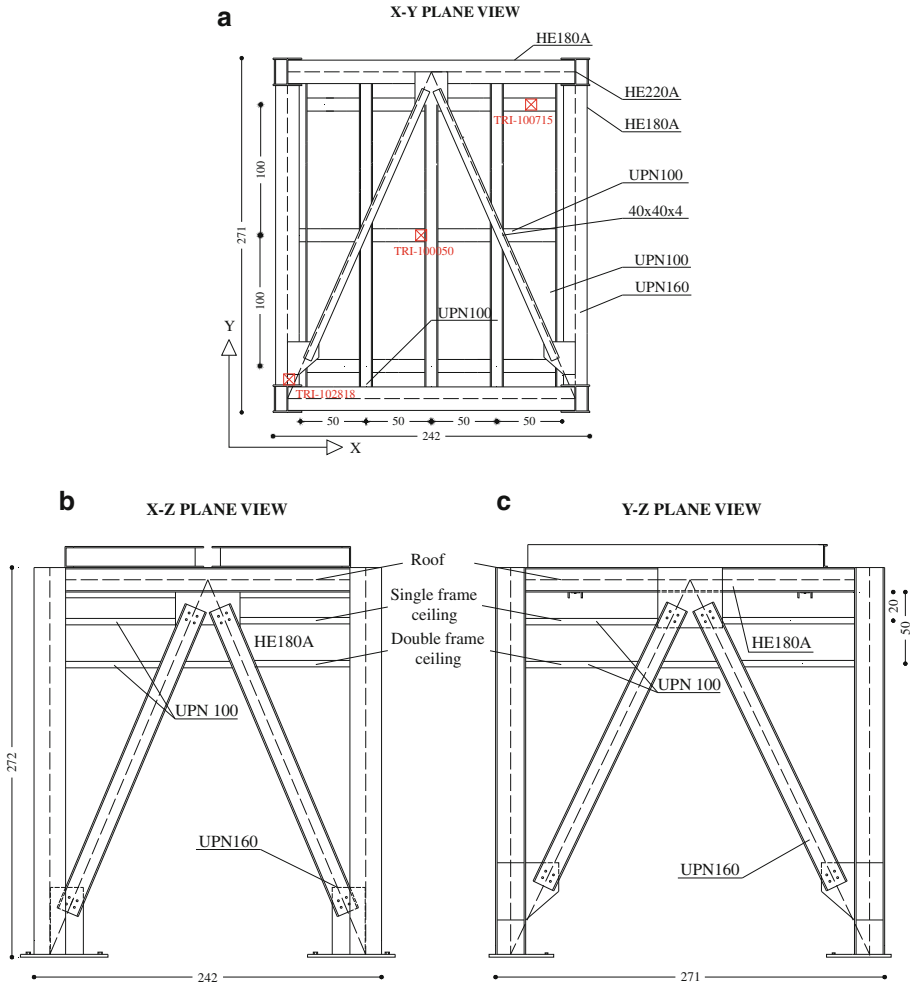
Technical scheme of the test setup: a plan view, b and c lateral views
